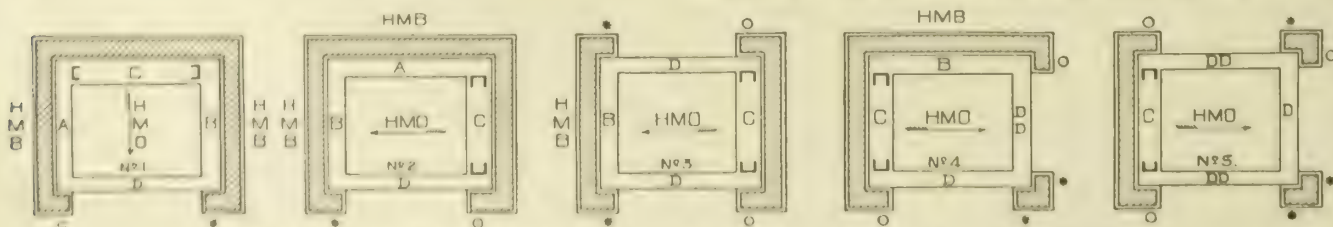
TYPICAL ARRANGEMENT OF DOOR OPENINGS AND HOISTING MACHINES
